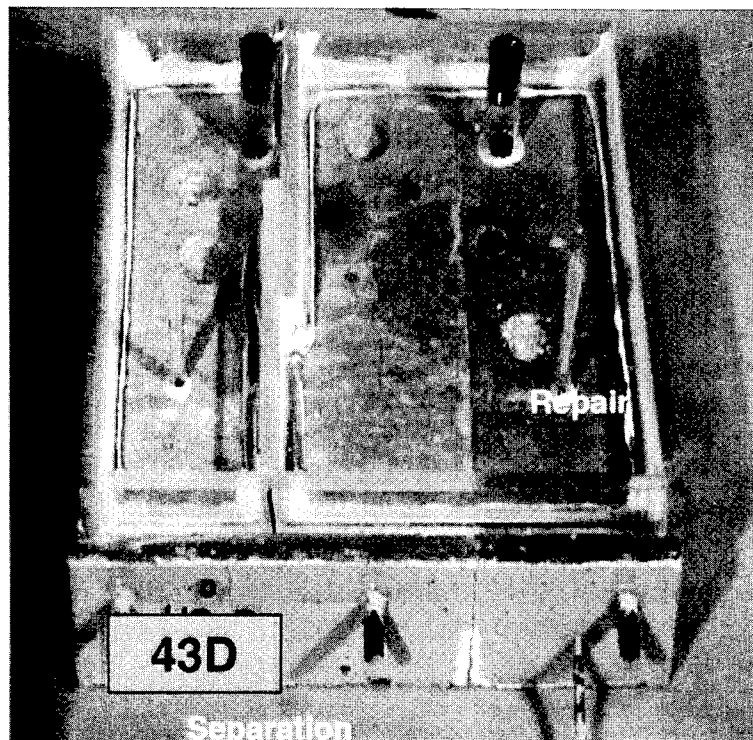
Photograph of repair slab 43-D showing typical cracking.
